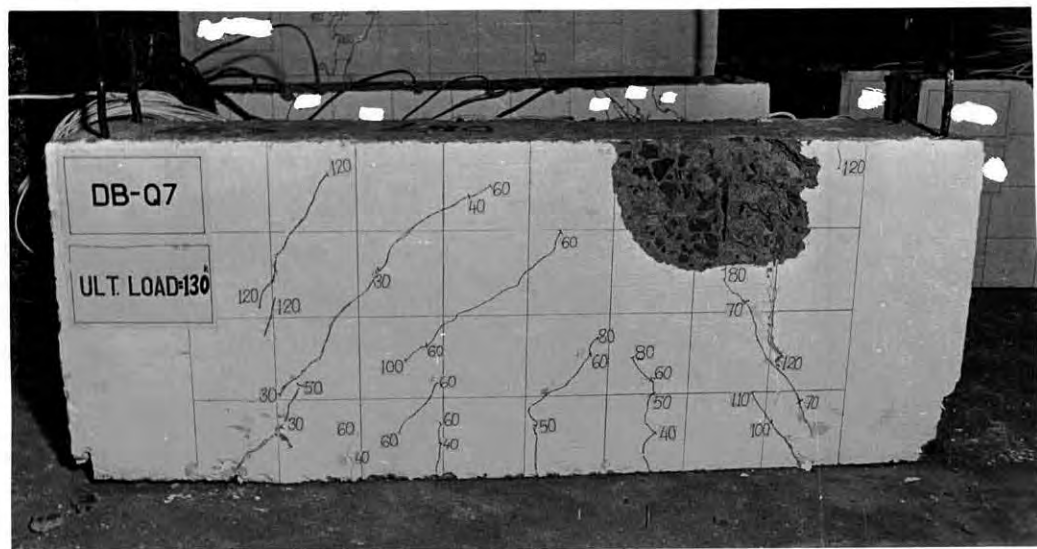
Mode of Failure and Crack Pattern of Beam DB-Q7
